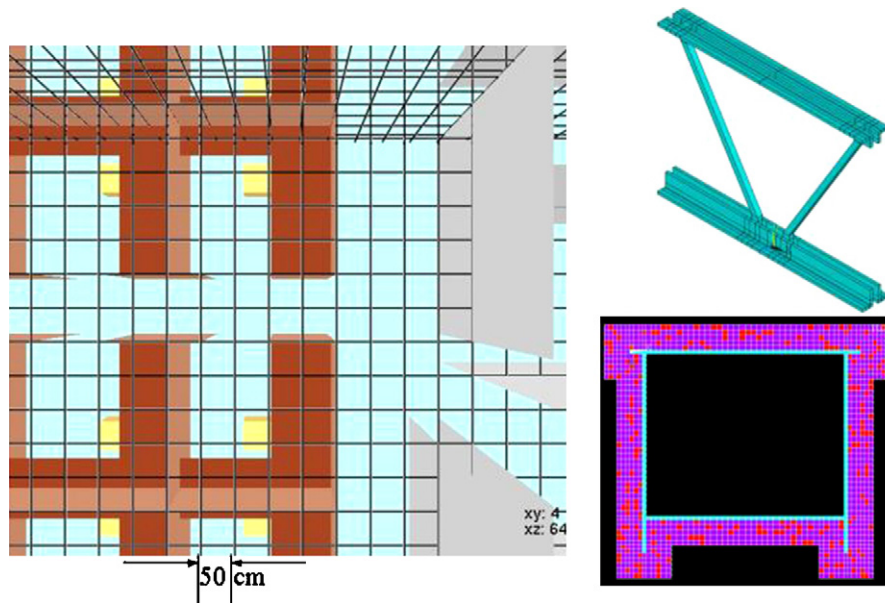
Portion of WTC floor gridded at resolution used for FDS simulations. A section of the floor truss system and a perimeter column cross-section as modeled in ANSYS are also shown. The truss rods are 2.5 cm in diameter and the column is 35 cm on a side. Courtesy K. Prasad (Baum, 2005).
